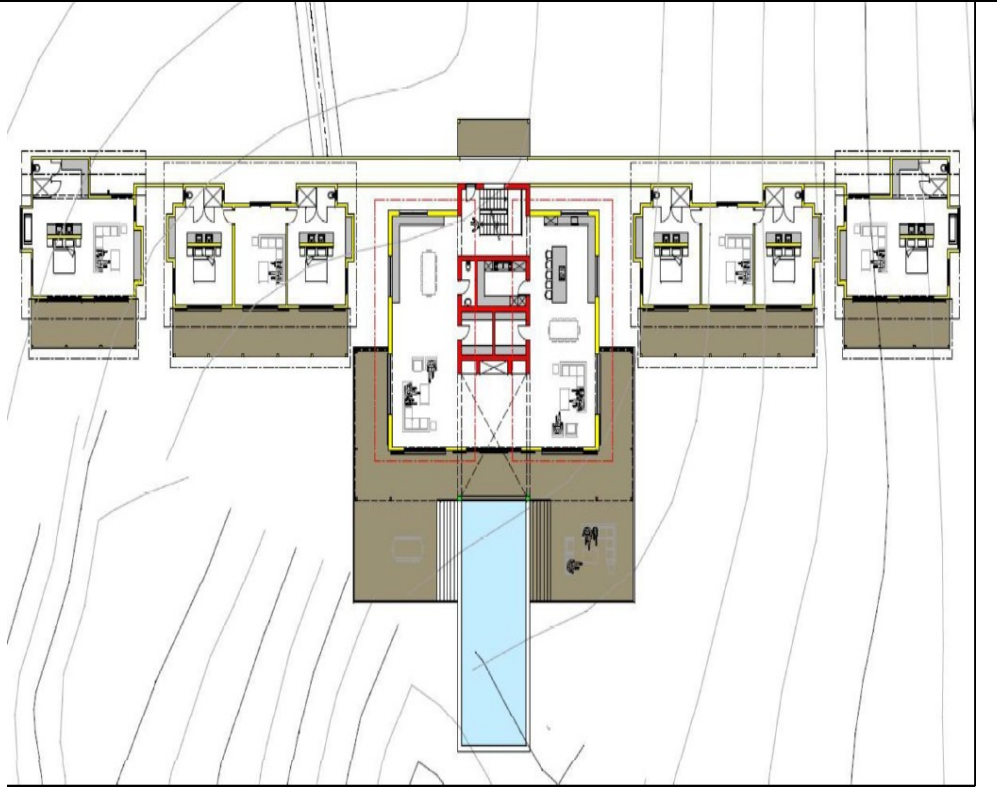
PROPOSED MAIN DWELLING HOUSE
